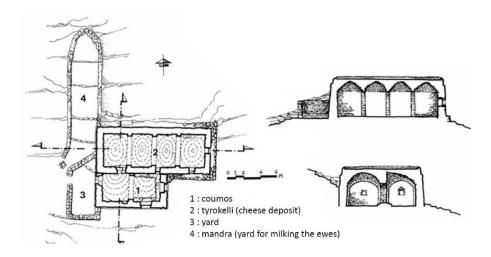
Plan and sections of rectangular corbelling domed *mitato* in White Mountains, West Crete (Arakadaki, 2009).
